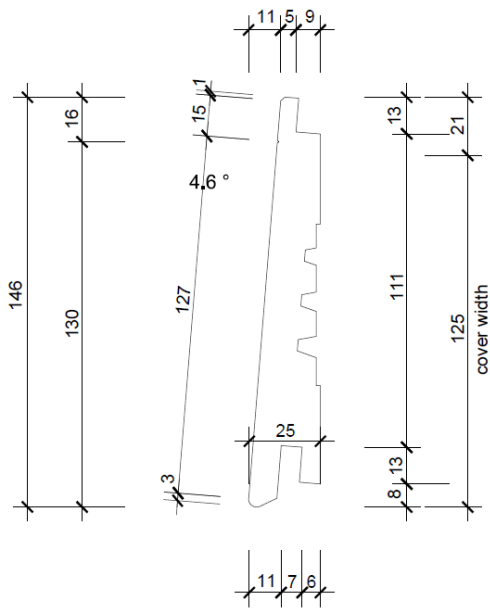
Dimensions of the wooden boards used for the tongue and groove cladding [in mm]
